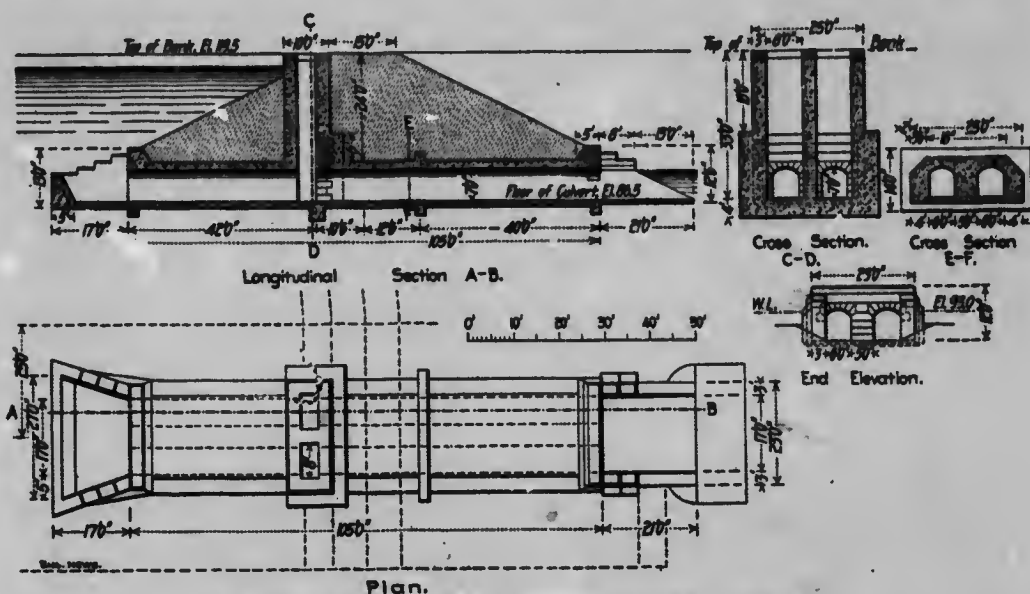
DETAILS OF RECTANGULAR CULVERT; LOCK 2.
